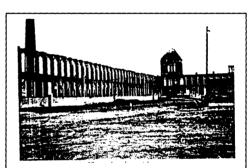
Mill After the 1942 Fire Main Section, Tower and Picker House
